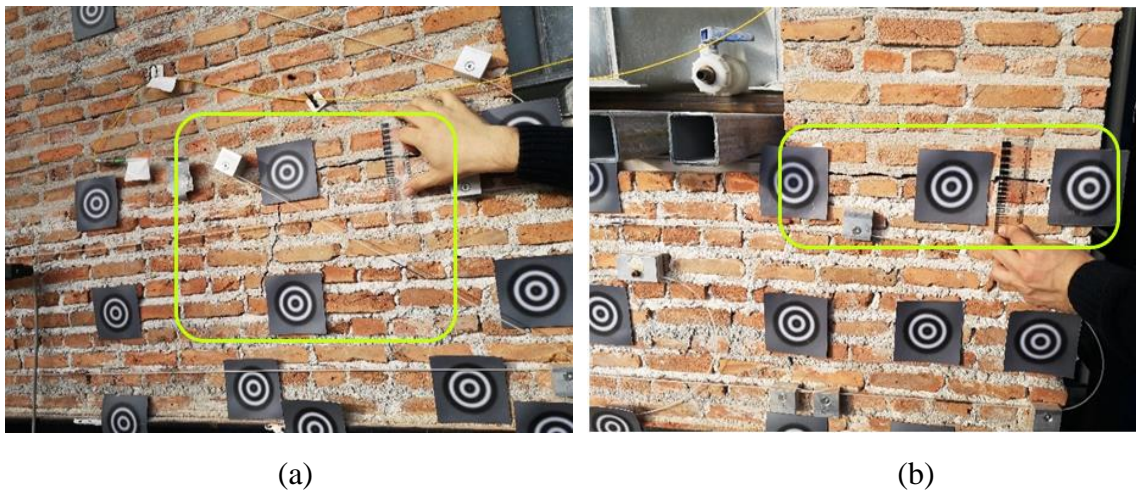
Crack width is determined by crack ruler after Test 3: (a) for the middle part of the back wall and (b) for the bottom-right corner of the back wall.
